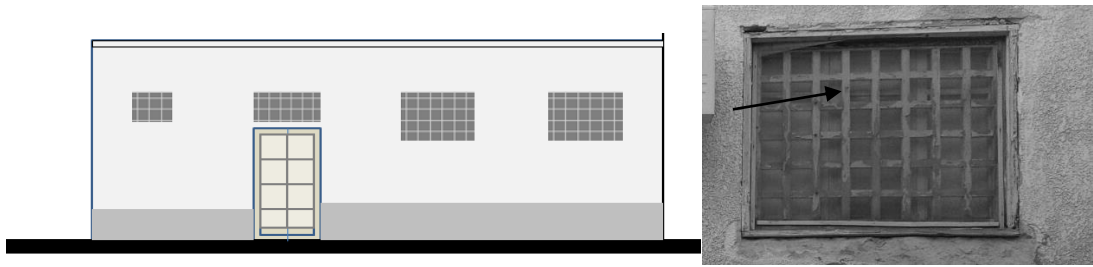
Security system; the external façade; the windows are higher than the level of pedestrians
